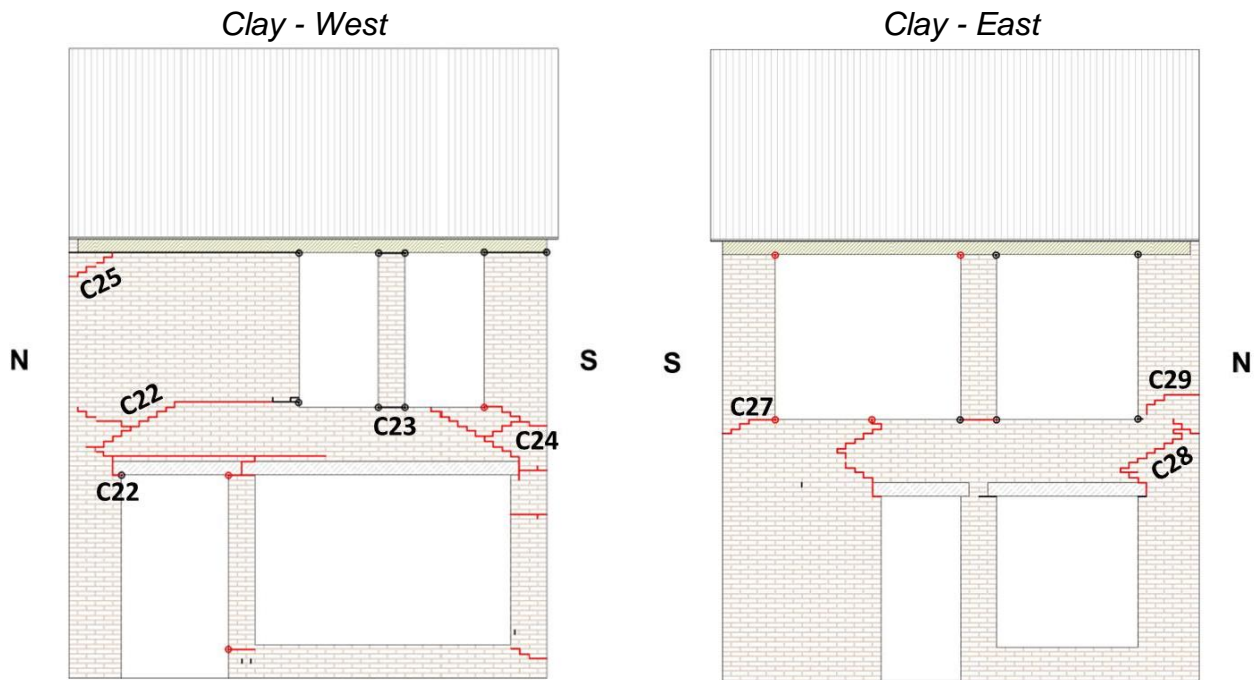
EQ-NPR 85% cracks – West and East clay façades.
